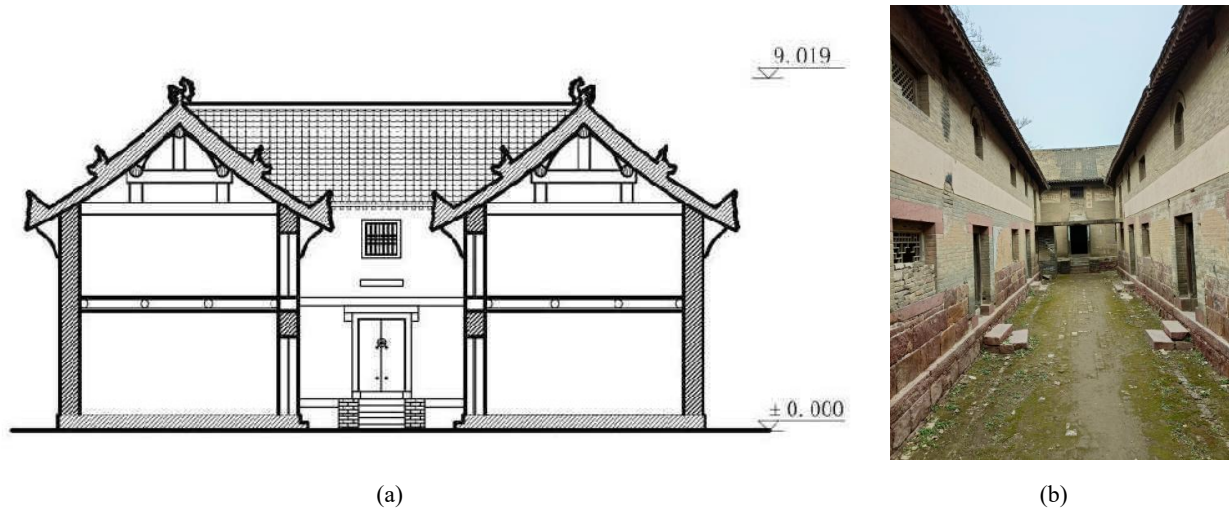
Elevation of backyard. Source: Drawn and Photographed by the author.
